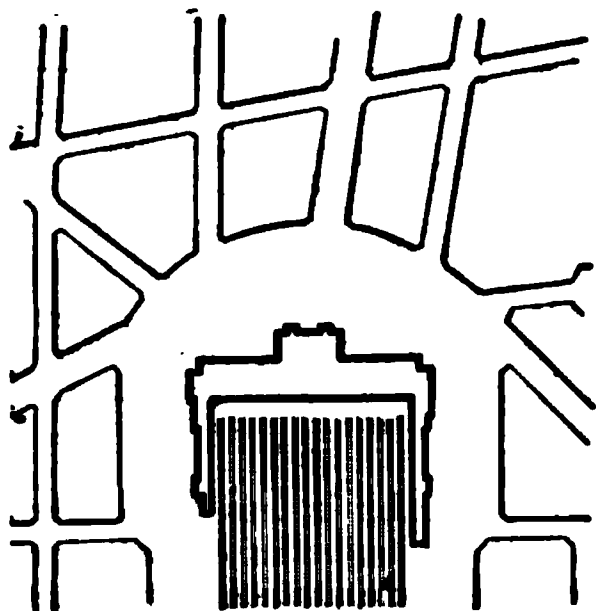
Plan Showing Location of the Principal Railway Station at Frankfurt-on-the-Main, Germany
